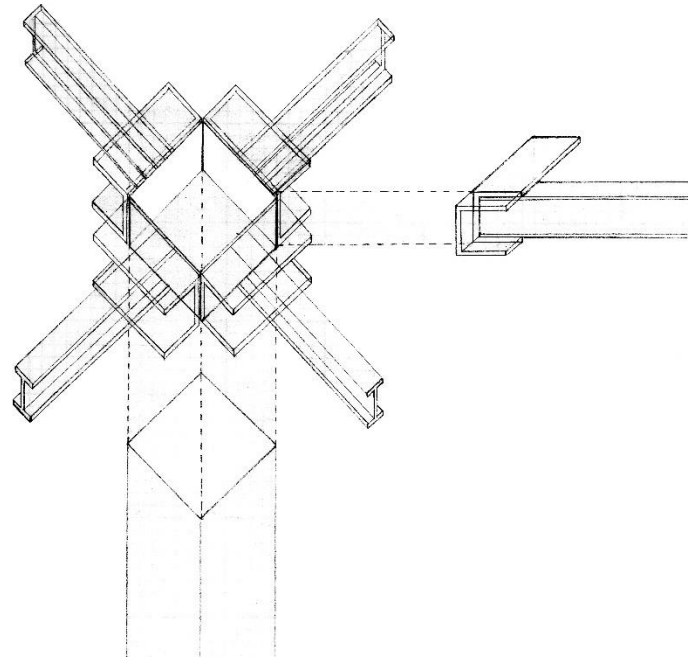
Steel channel section forming a collar around the reinforced concrete column and allowing I-beams to support the new prosthetic construction.
